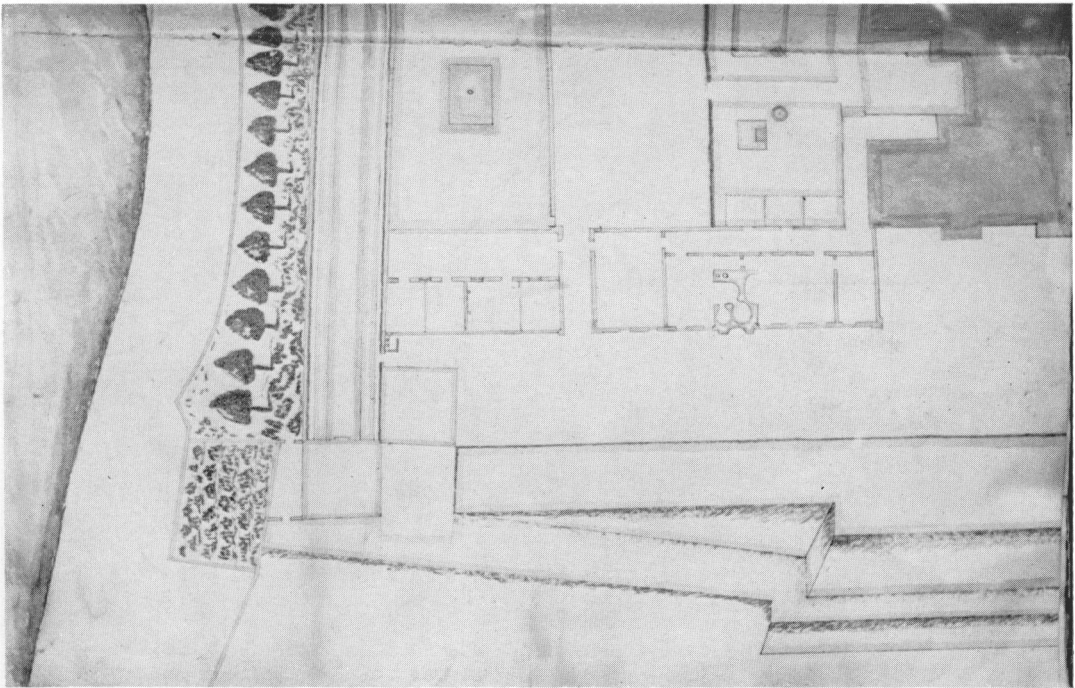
Plan of north garden and west terrace, Kings Weston [52]
